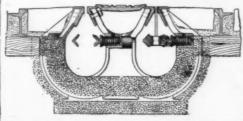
ELECTRIC RAILWAY CONDUIT FOR DOUBLE TRACK ROAD.
